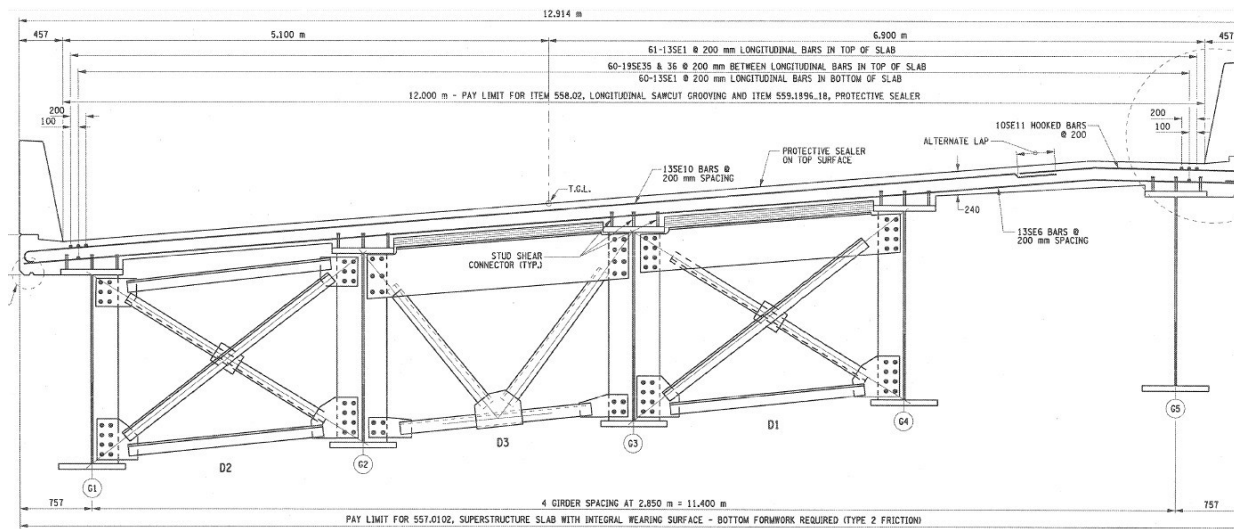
Section View of I-290 Ramp B over I-290 Ramp D and I-190
